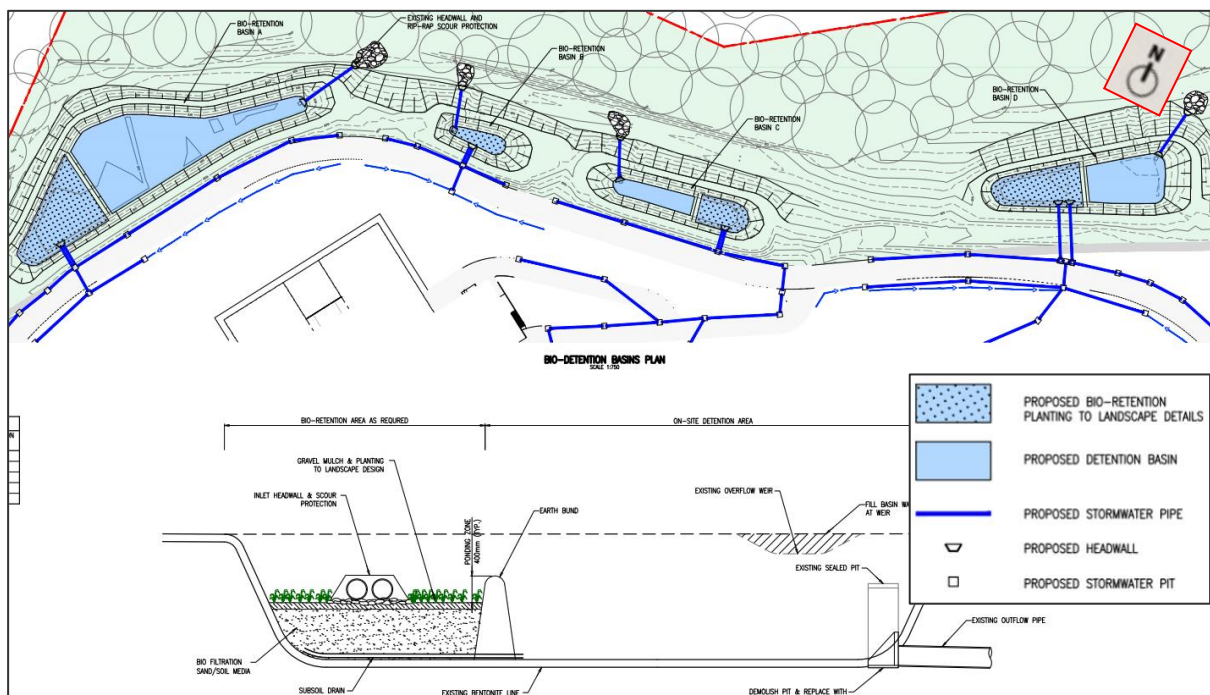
| Extract from the stormwater plans showing bioretention basins (Source: Applicant's RTS)
